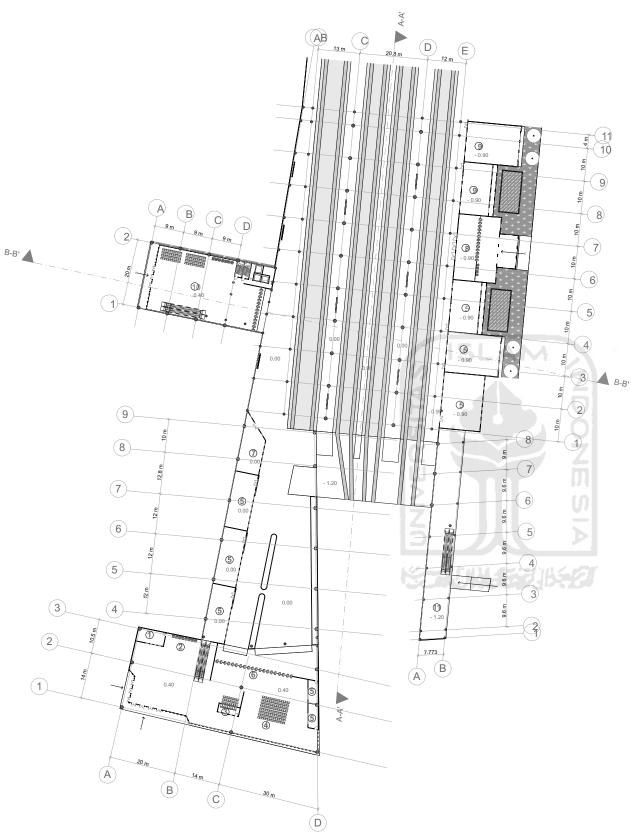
Groundfloor plan of the mixed use building Source: Author (2021)
